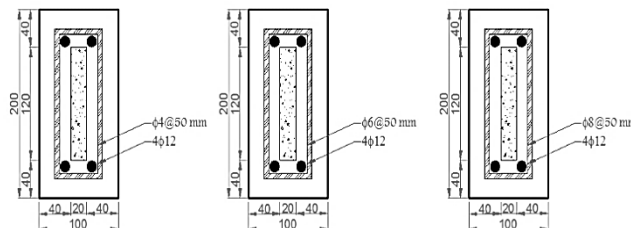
The hybrid beam with different transverse reinforcement (stirrups)
